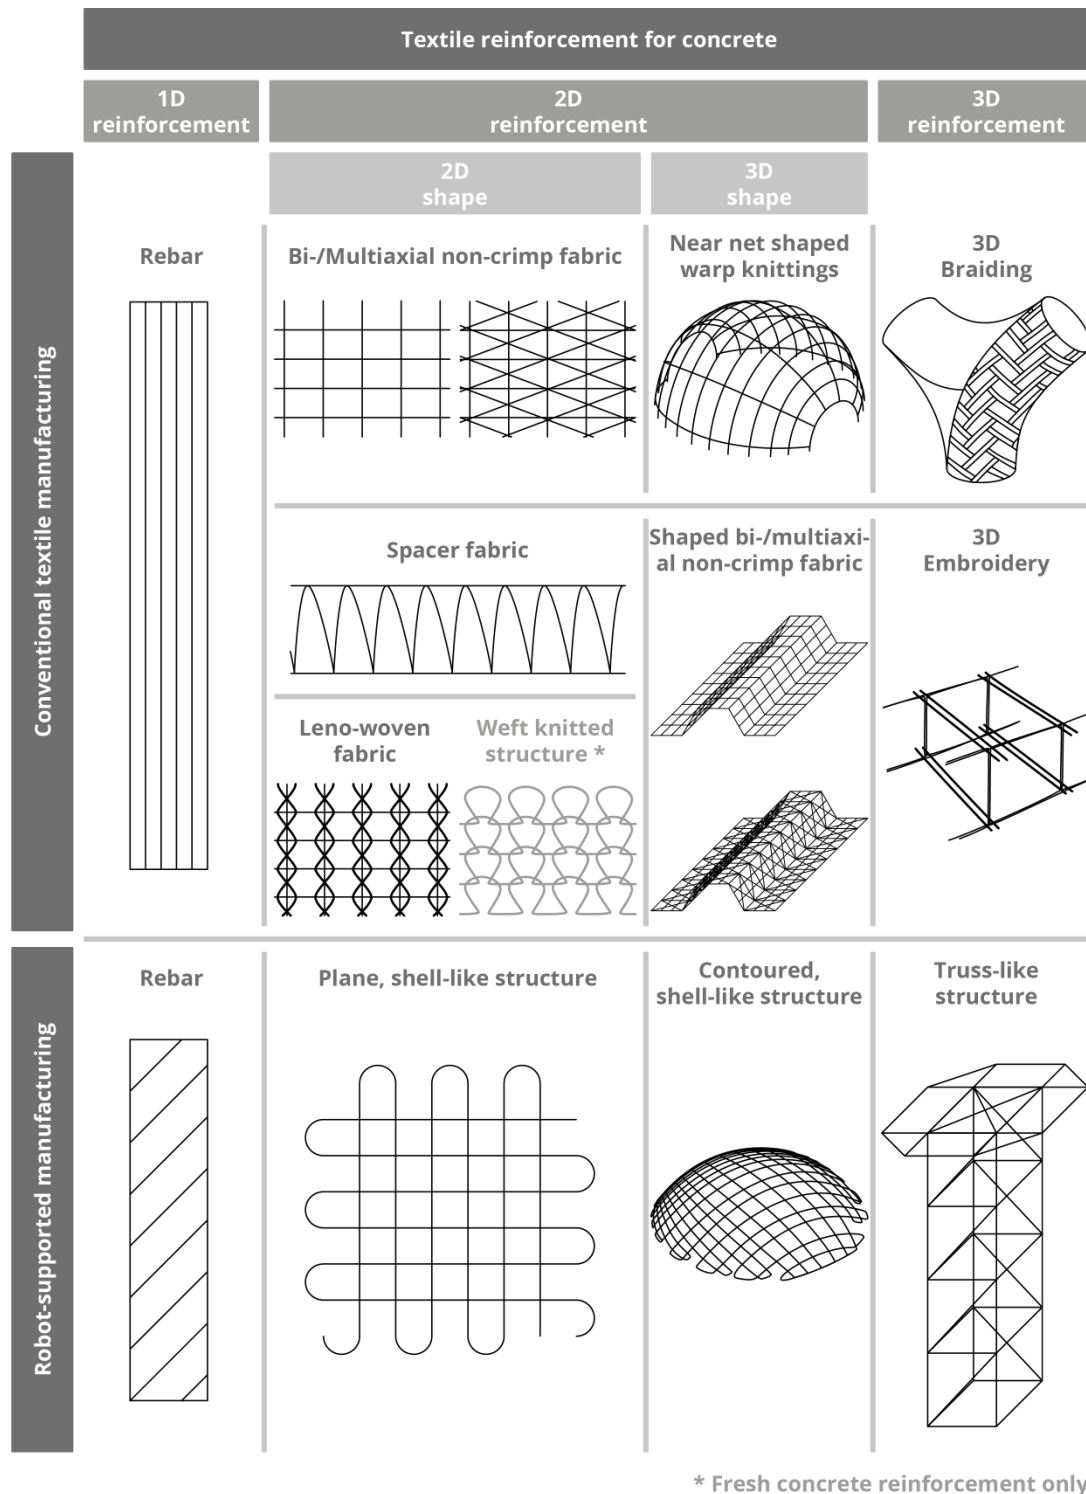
Schematic illustrations of different textile reinforcement types for concrete<sup>12,66-74</sup>
